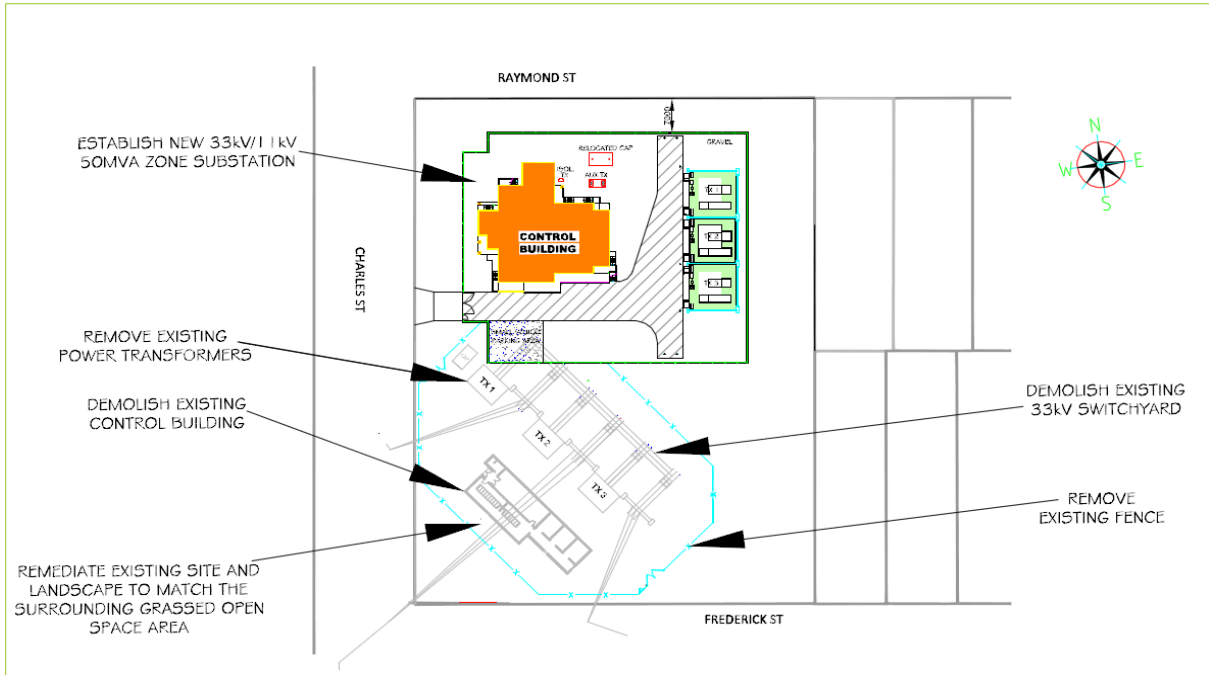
Marayong ZS redevelopment- diagram of the new Substation location and the proposed general arrangement (site layout).
